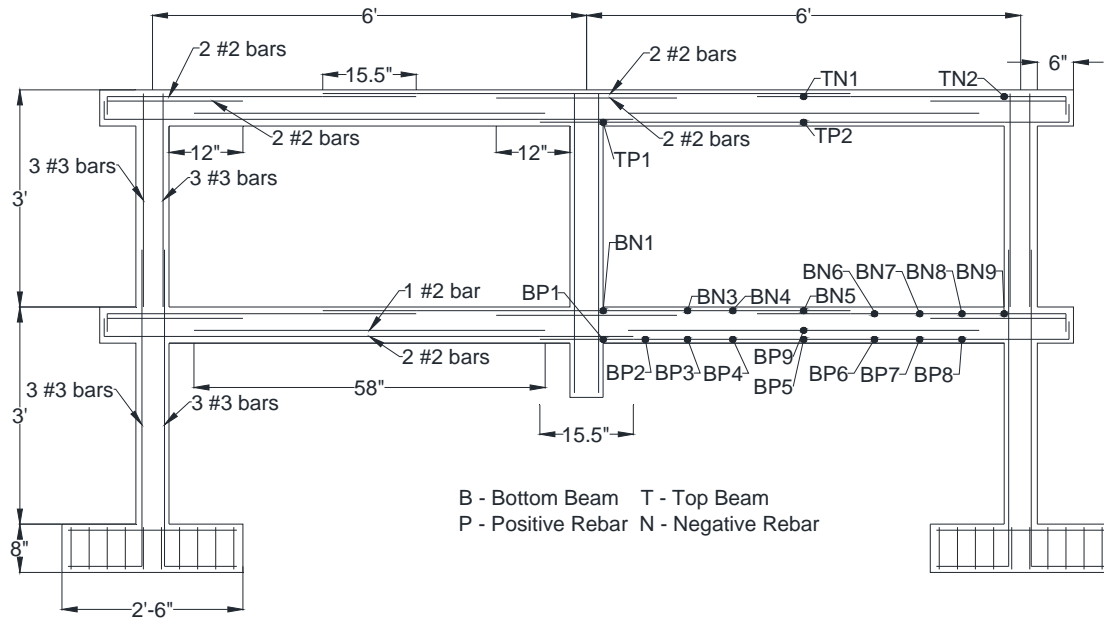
Strain gage layout for test frame with continuous reinforcement
